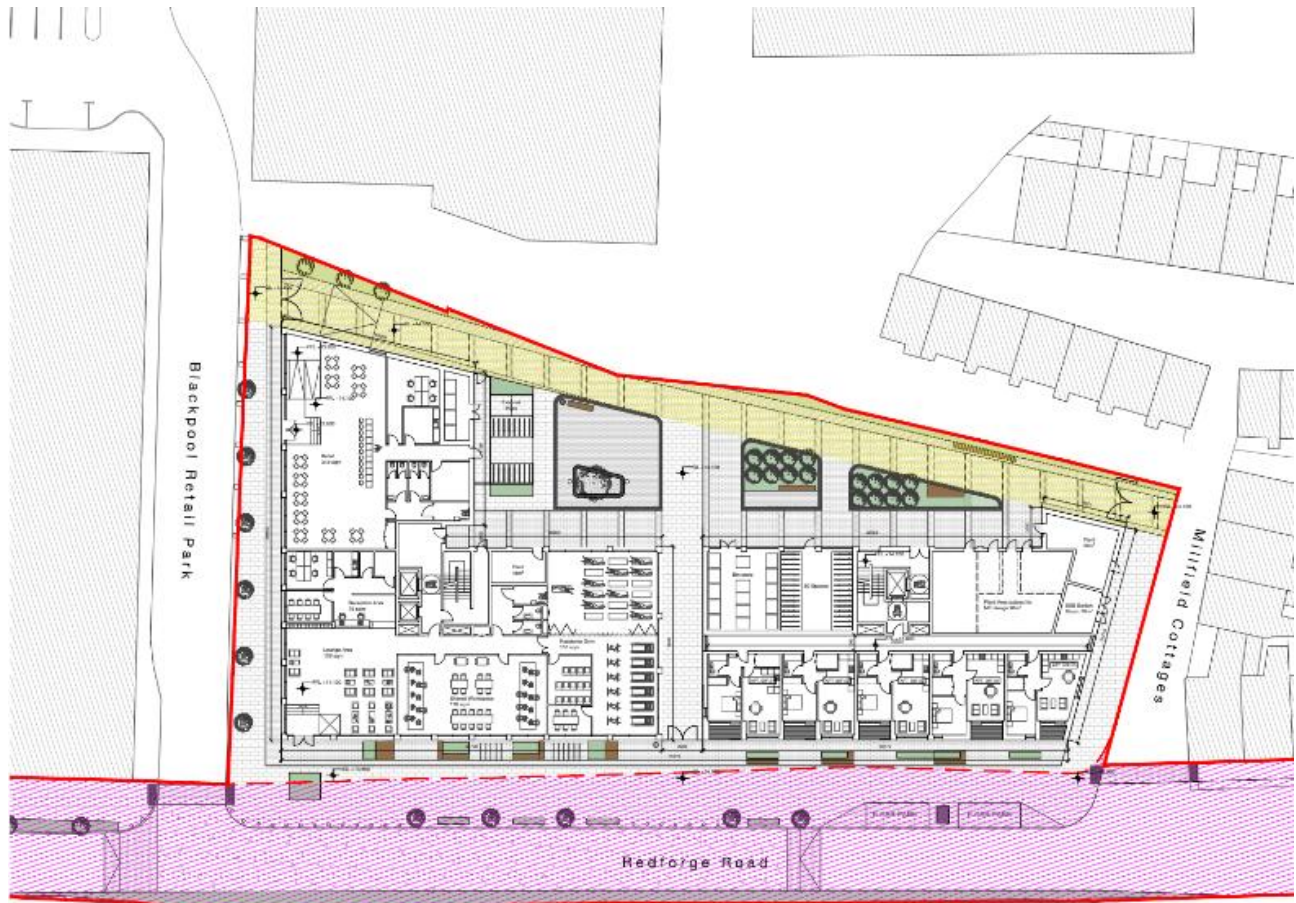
Proposed Site Layout and ground floor plan (Architectural Drawing No. A10-01 prepared by Butler\Cammoranesi.
